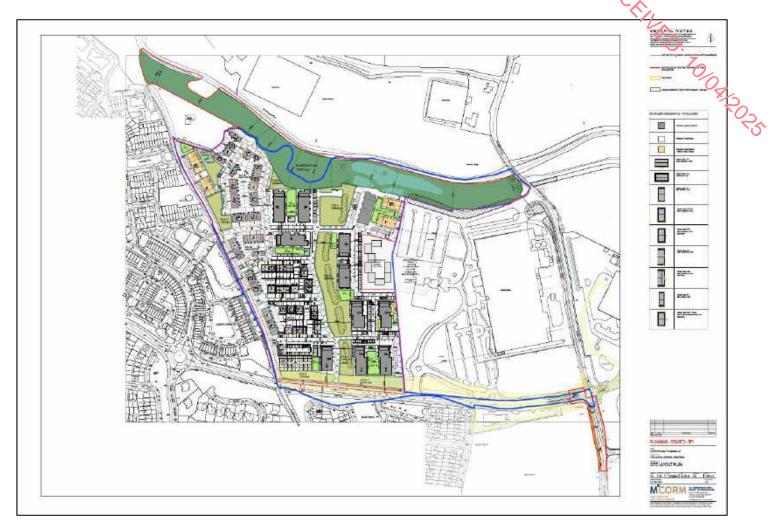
PROPOSED SITE LAYOUT (TOWNHOUSE) (DRG NO. PL-RFI-003, MCORM 2025).
